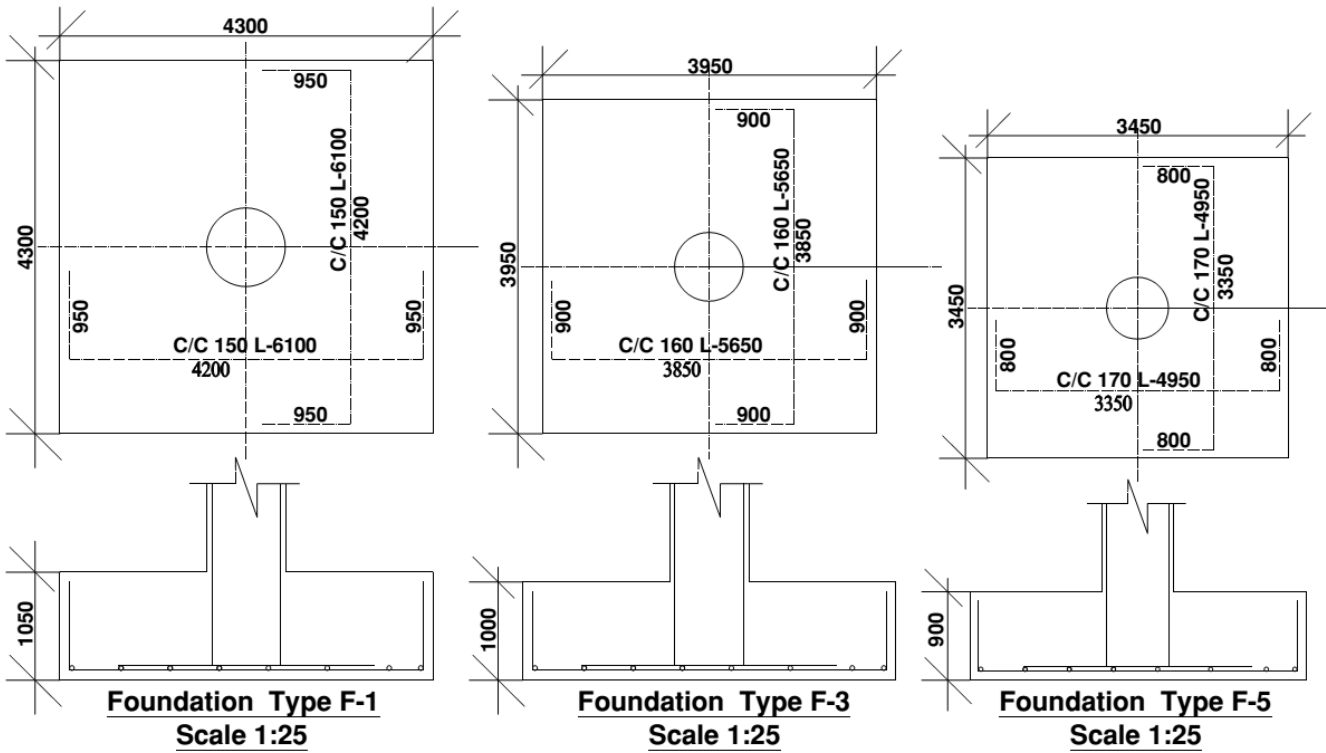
Sample foundation detailing for G+12 building with C-40 concrete
